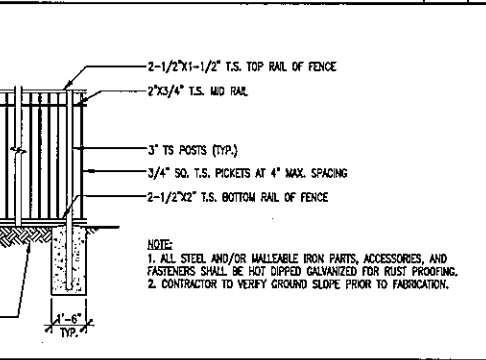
LA SCALE: 8 WROUGHT IRON FENCE
